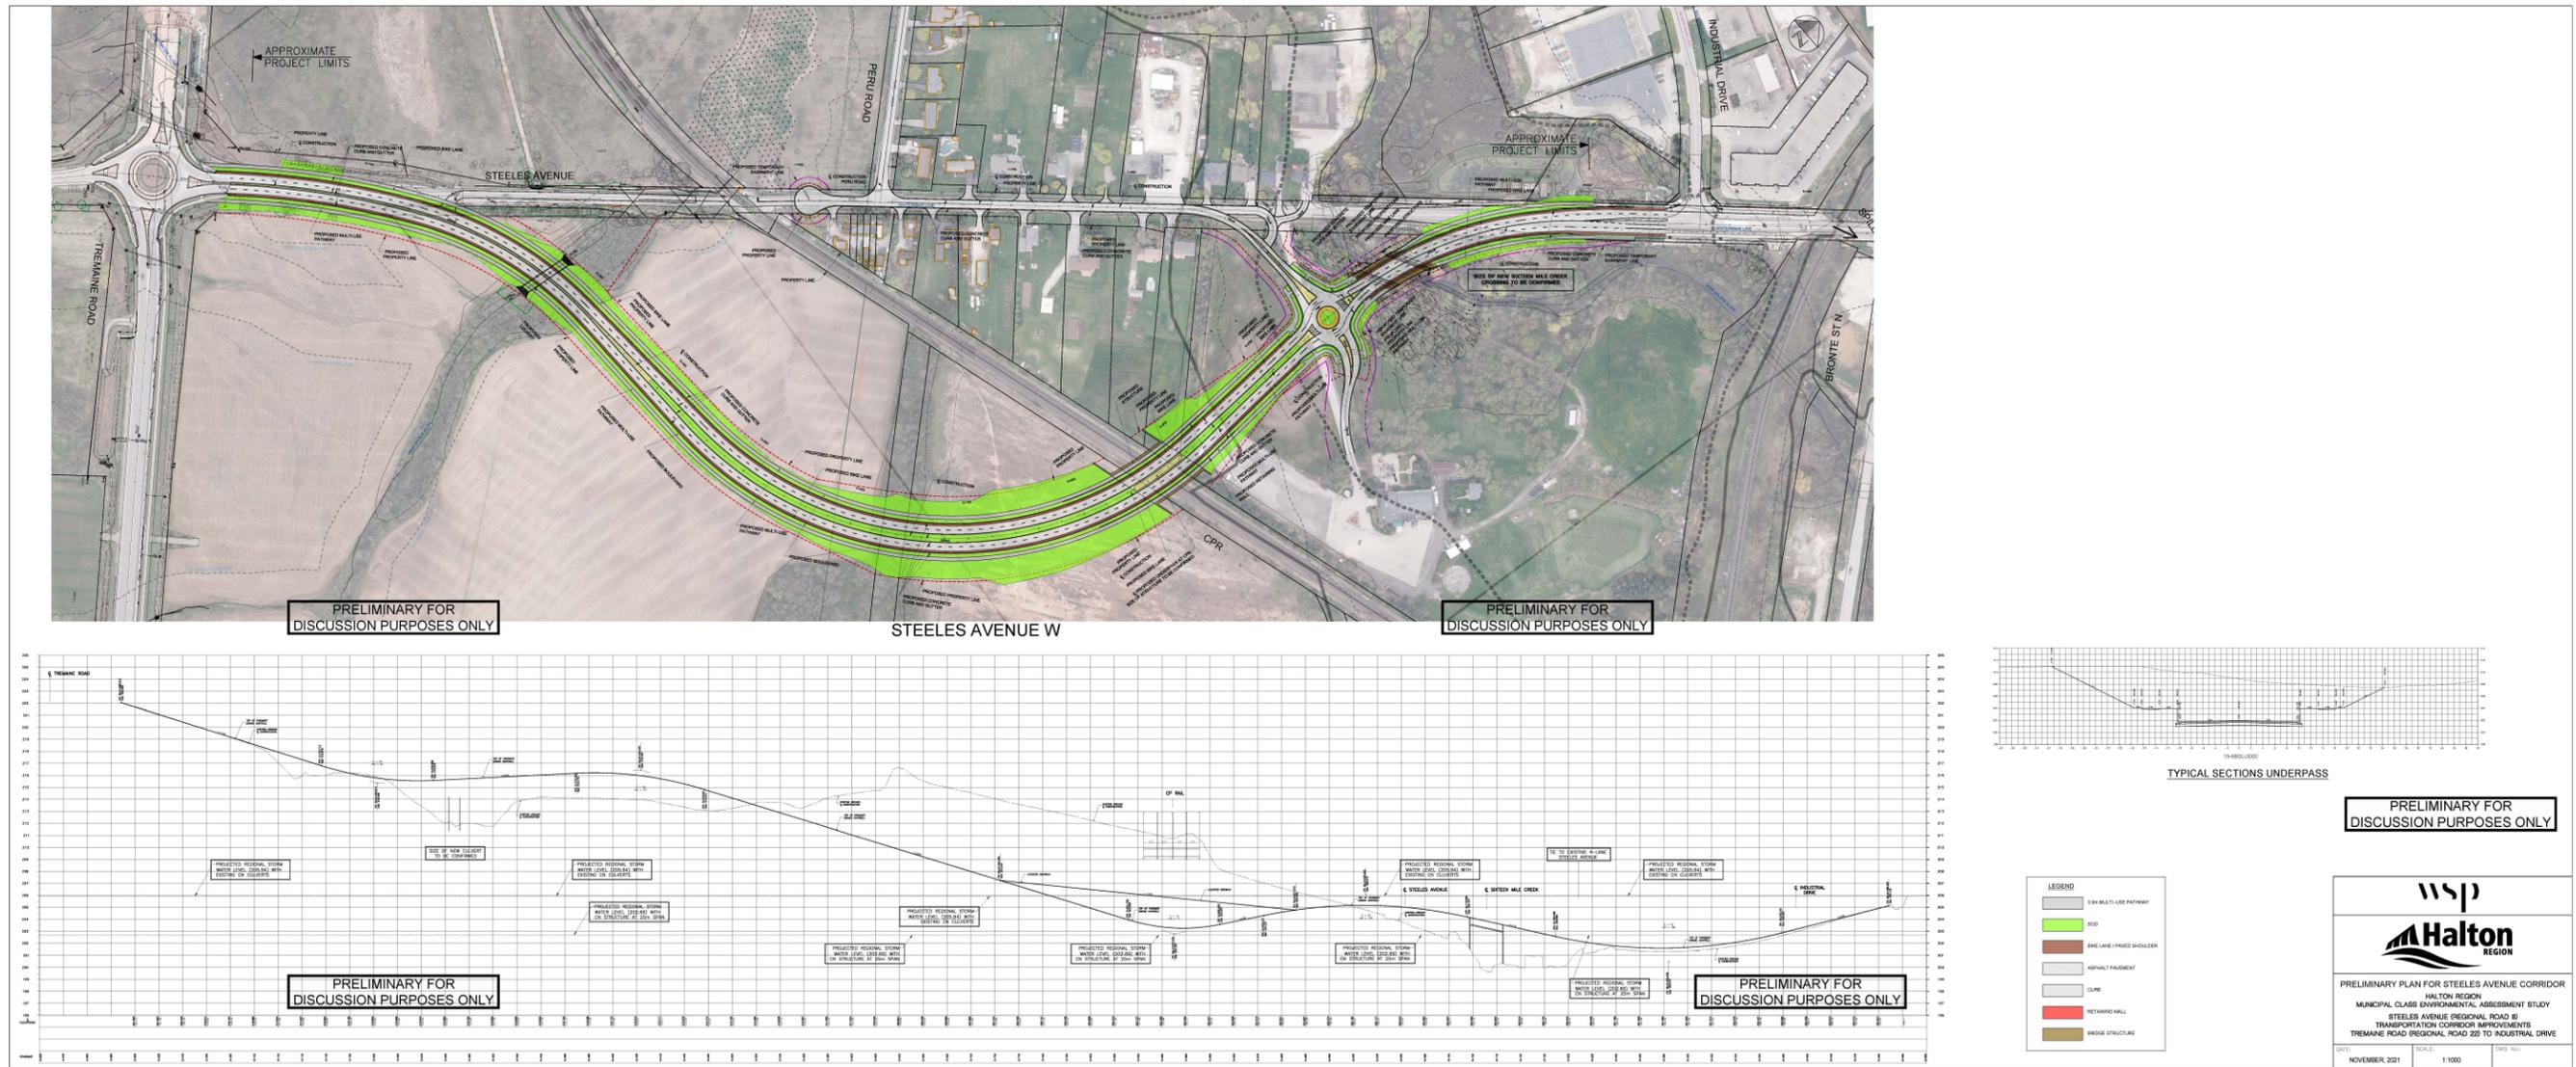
Preliminary Plan for Steeles Avenue Corridor, Halton Region, Municipal Class EA Study Steeles Avenue (Regional Road 8) Transportation Corridor Improvements, Tremaine Road (Regional Road 22) to Industrial Drive [November 2021]
